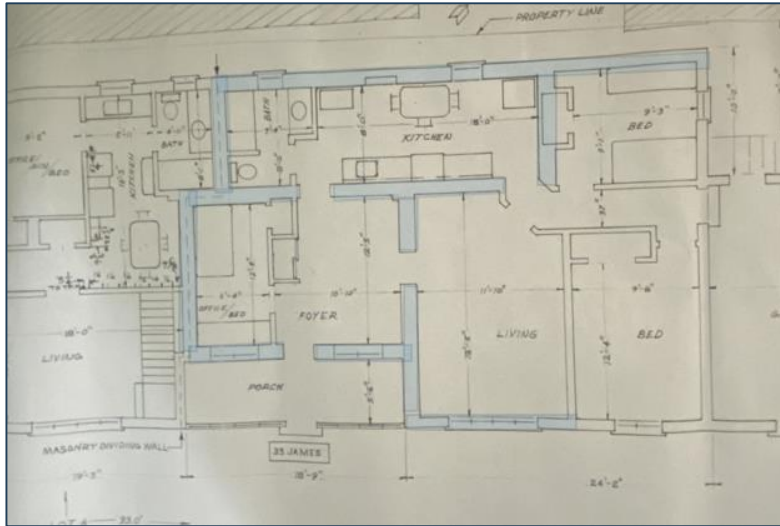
Building Permit Drawings by Tracey Clifford, c. 1985
